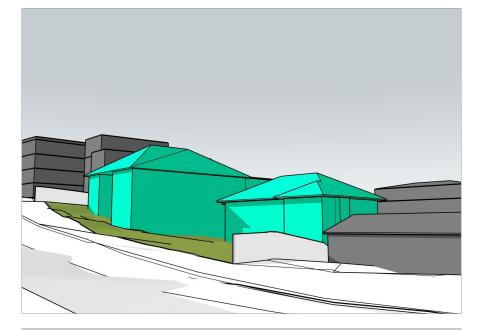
| View of existing subject site looking uphill along Dumaresq Street
